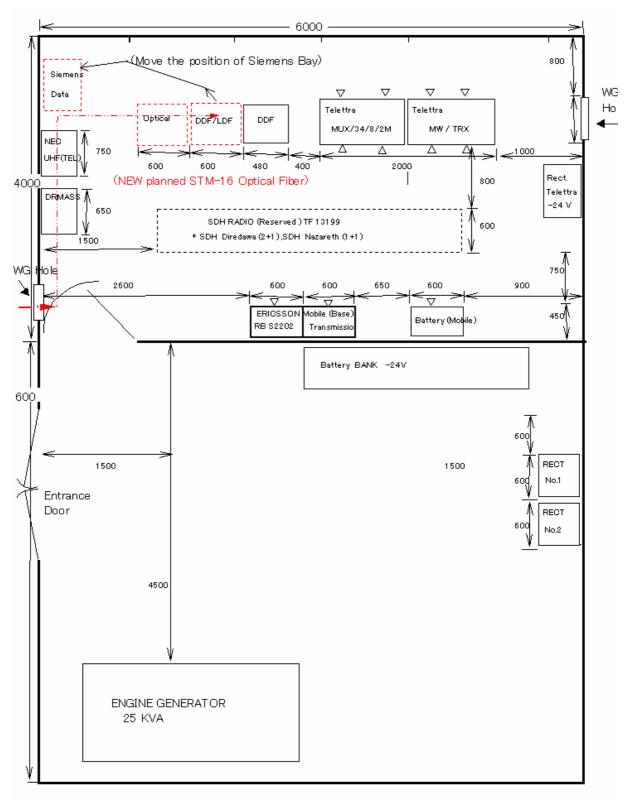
RADIO/MUX ROOM Planned Installation Place (ADAMA WEST NW Rep. )
